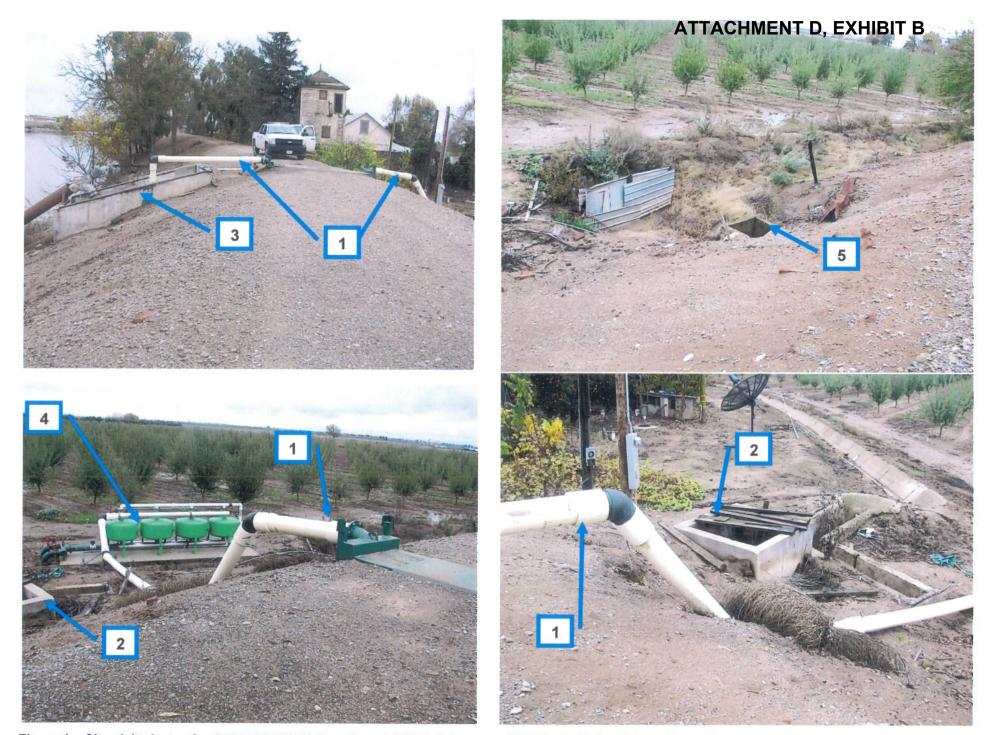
Site visit photos for APN 162-160-03 Dan Roza, T2012110 (source: CVFPB staff site visit on December 6, 2012)
